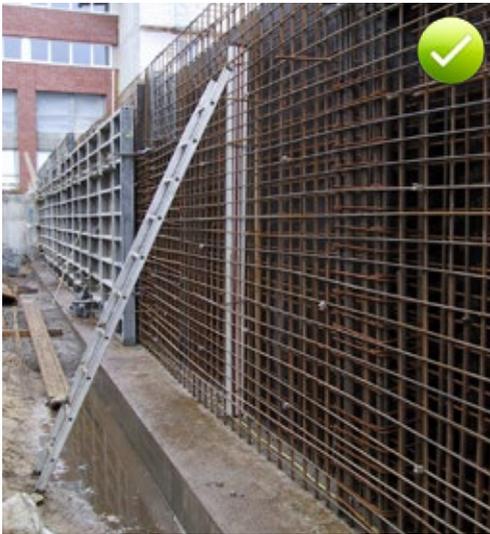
Crack inducing bar with swellable coating for waterproofing the induced joint
